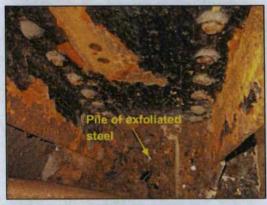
Base of column at Location 1 with massive pile of exfoliated steel at base.
